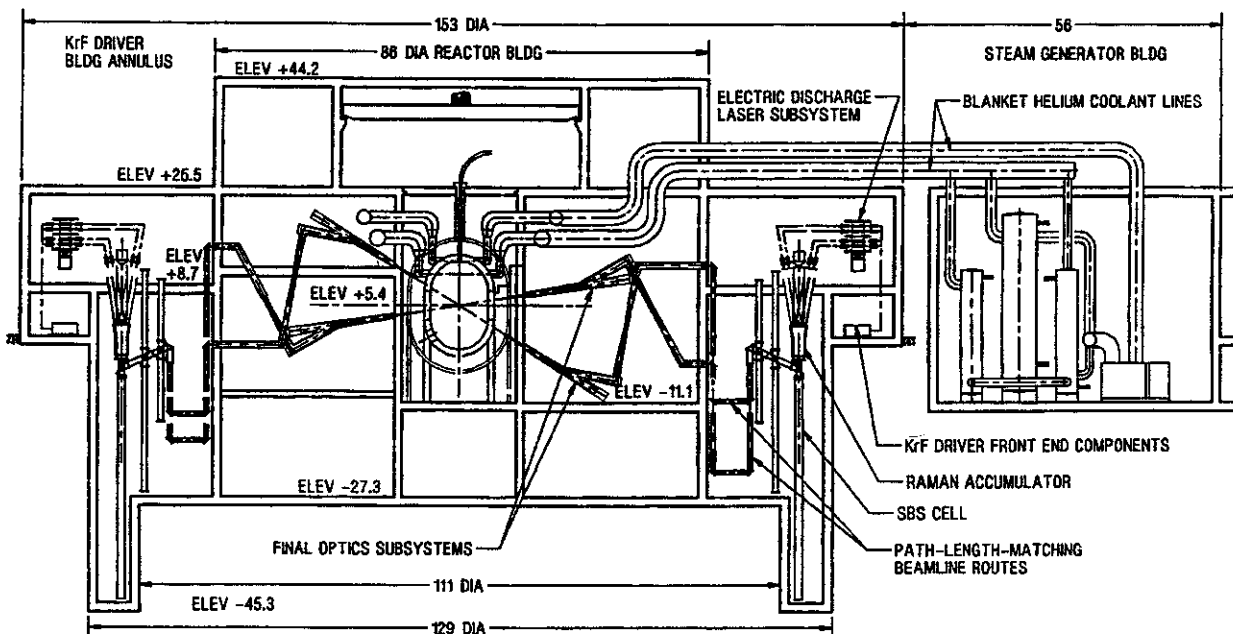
Elevation View - Typical Laser Beam Routing-10 Places
